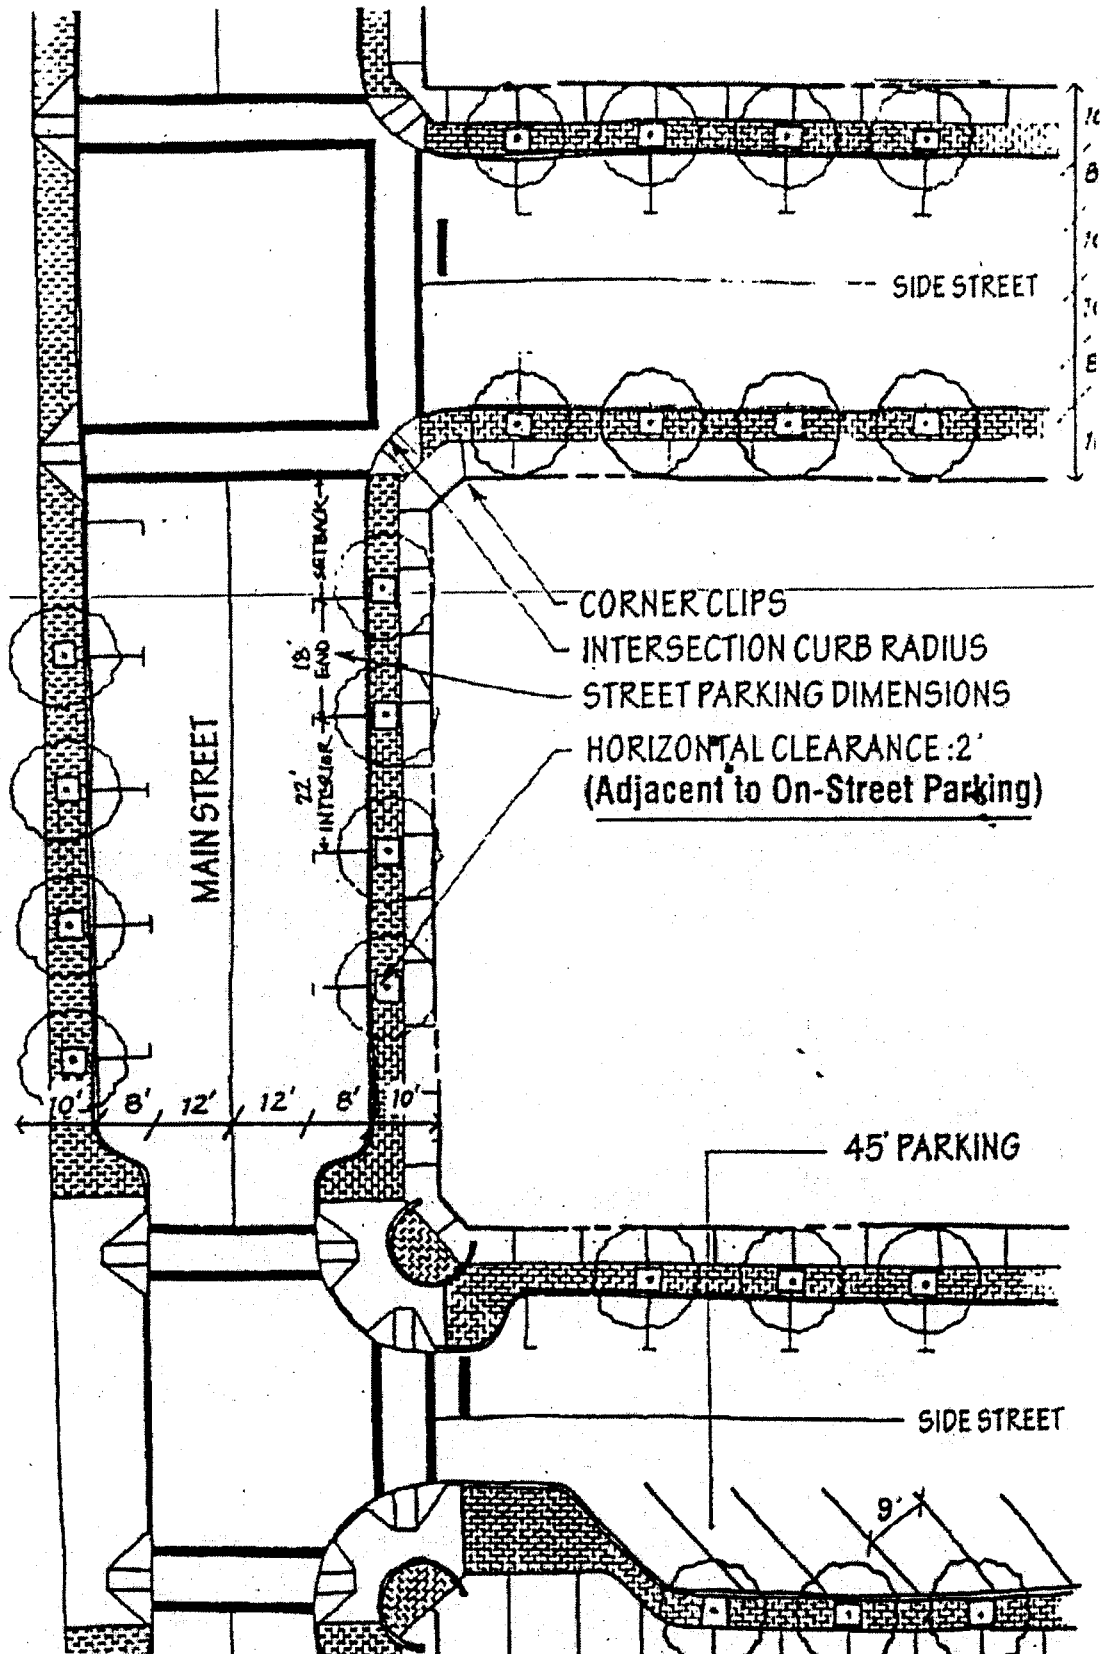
(b) Village Center Typical Street Layout (Not to Scale)
